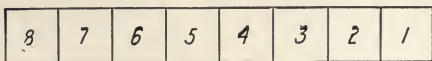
Sketch Showing Method of Concreting Alternating Slabs.
